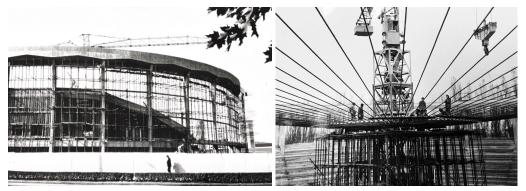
The outer compressed ring during construction (left) and the assembly of the inner ring, radial cables (right) (UB-FA Archives)
